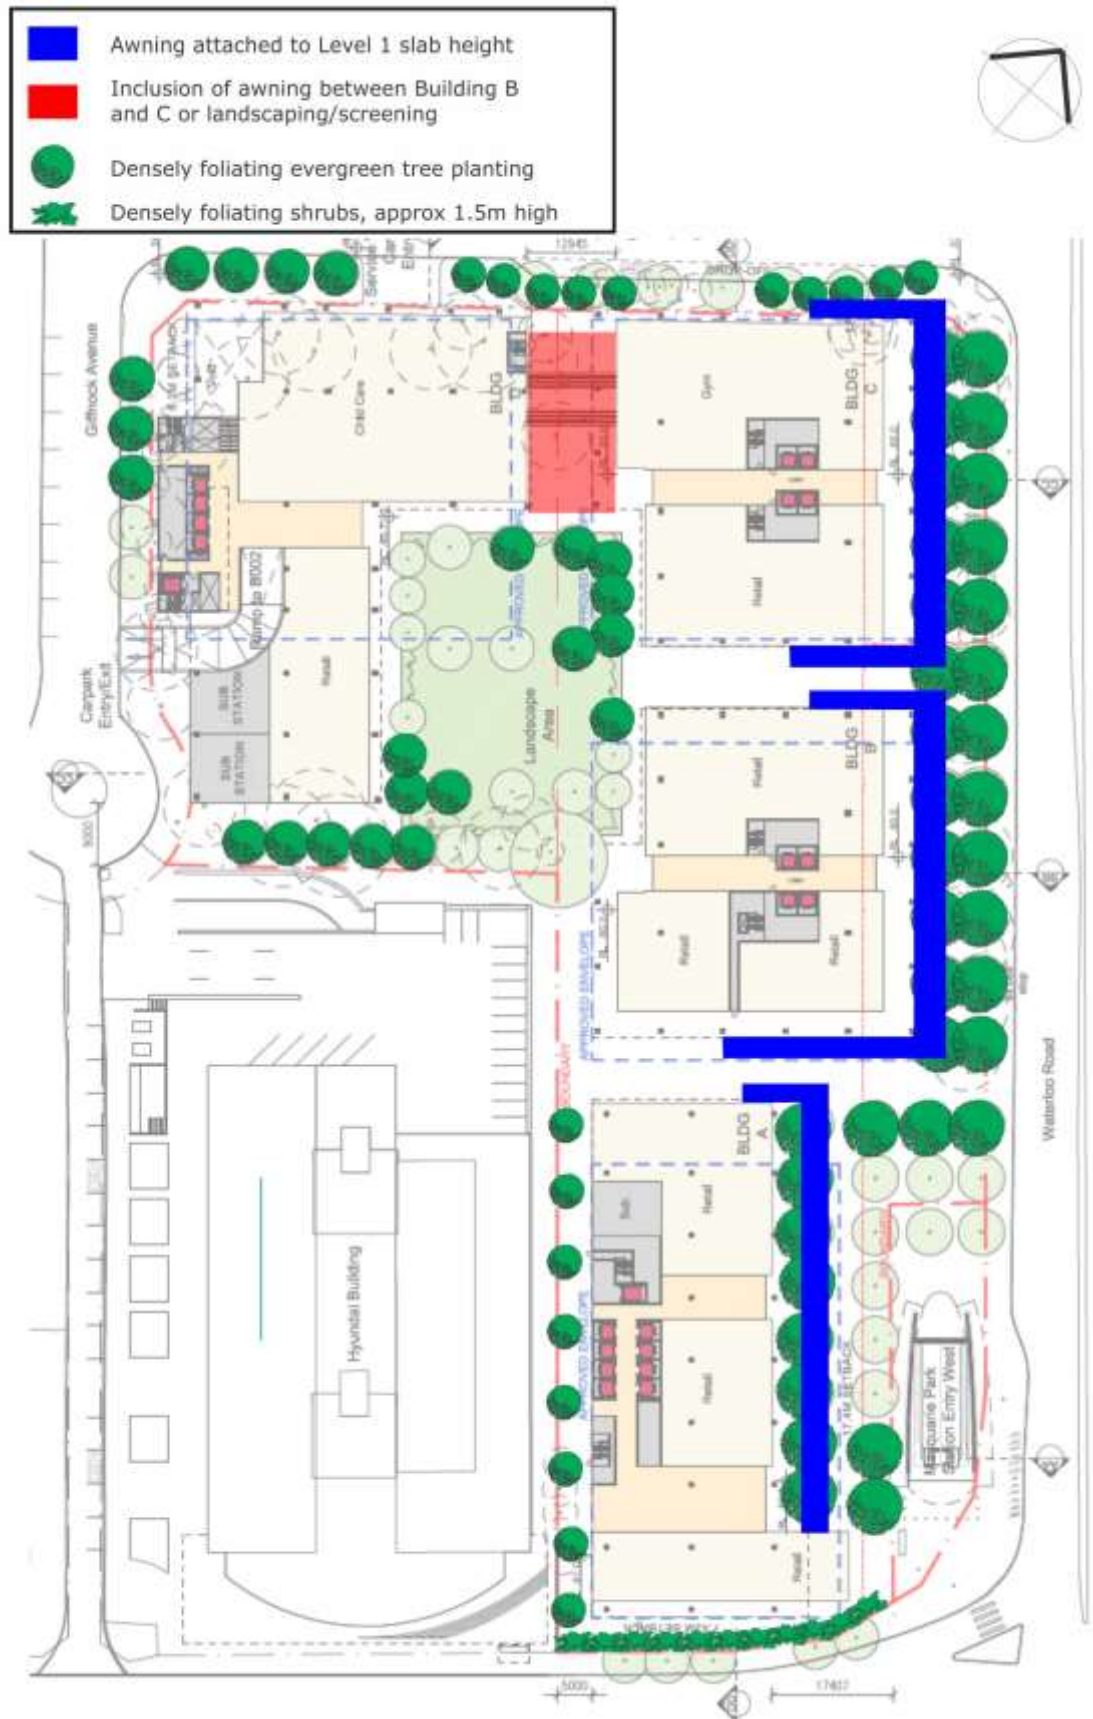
Recommended Treatments on an Indicative Ground Floor Plan
